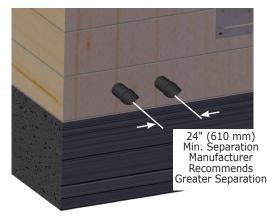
Side Wall Coaxial Venting CAN BE USED ON ALL SIZES
